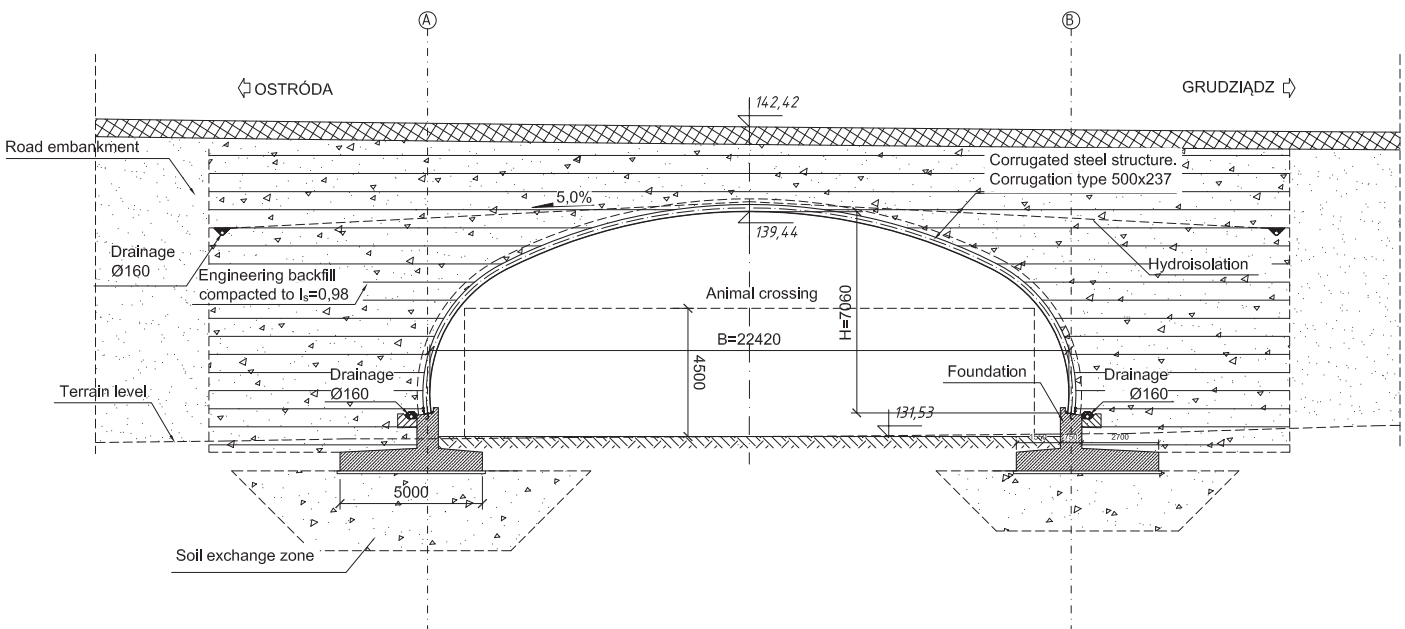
The soil-steel Bridge (SSB) as wild life underpass solution.
